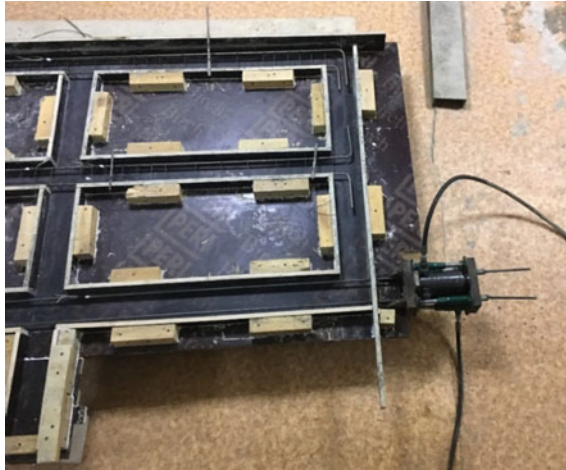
Prestressing of reinforcement in the beam above the first floor of the experimental structure of the FR-2 frame
